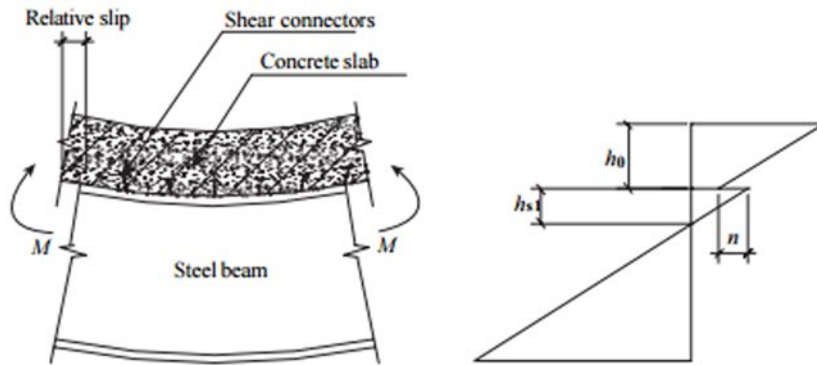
Beam with partial composite action: (left) force and deformation of steel beam and concrete slab; (right) stress distribution along section height (Li *et al.* 2007).
